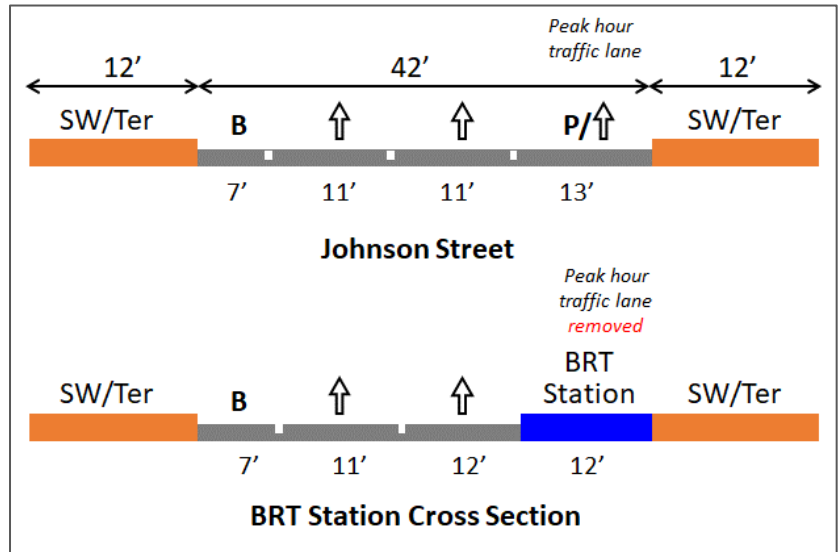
Existing and conceptual cross sections for Johnson Street just west of State Street
